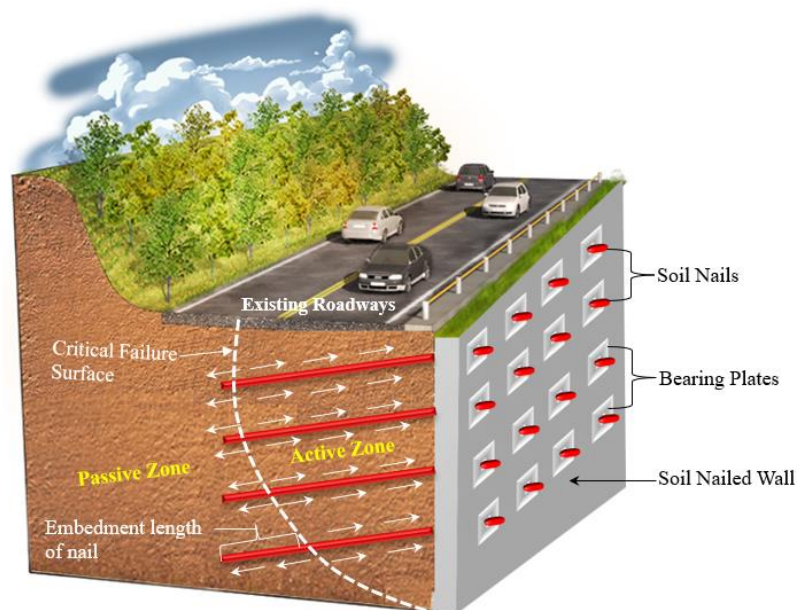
Pictorial view of a soil-nailed slope with a soil-nailed wall (modified after ACE Geosynthetics)
